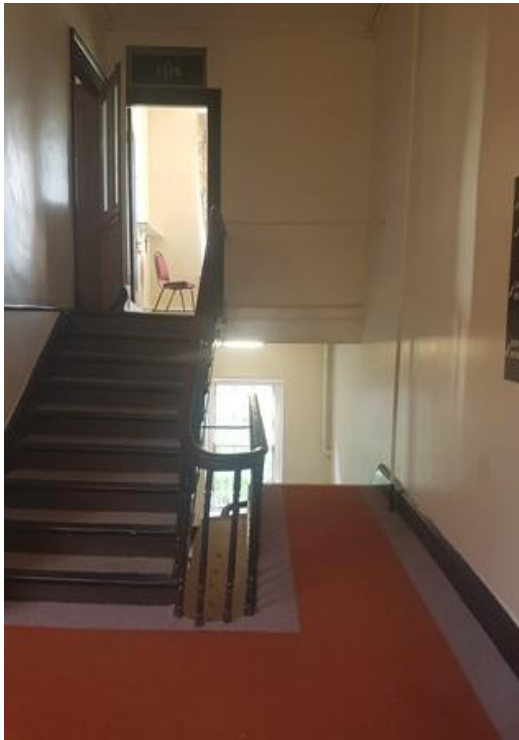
Stairs to rear of former chapel accessing the chapel ante-room
